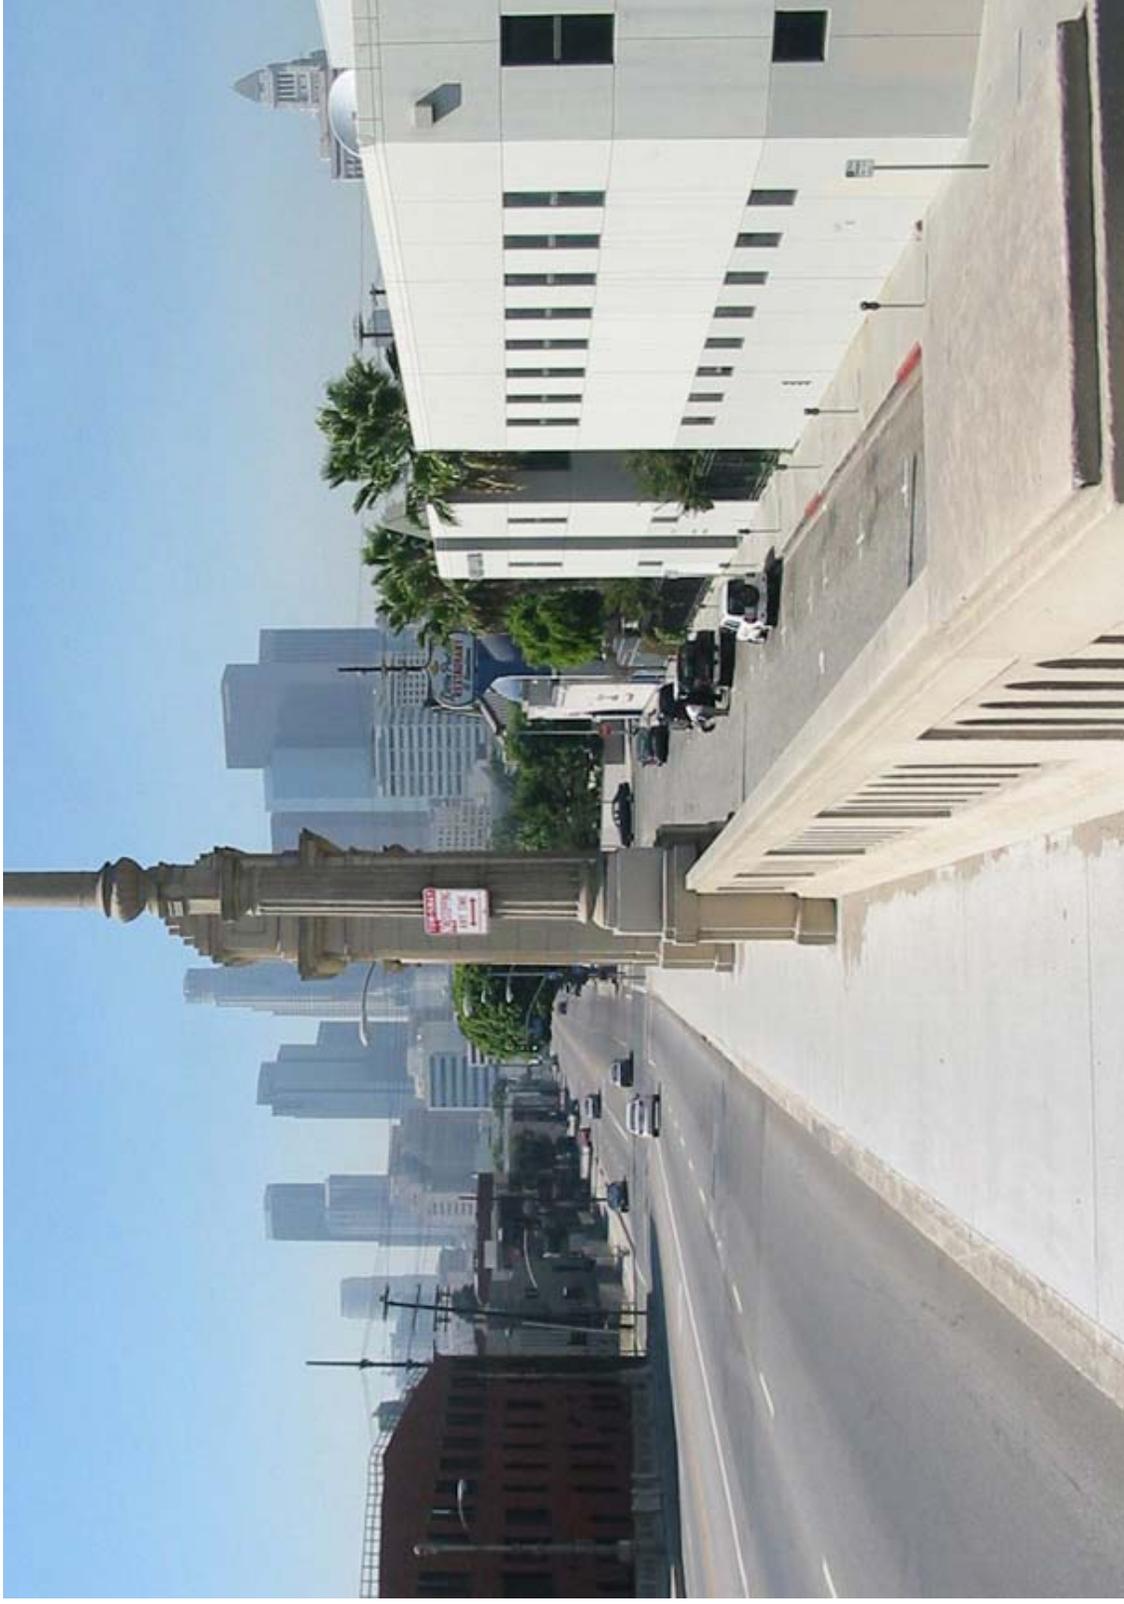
View West, Downtown - From 1st Street Bridge
